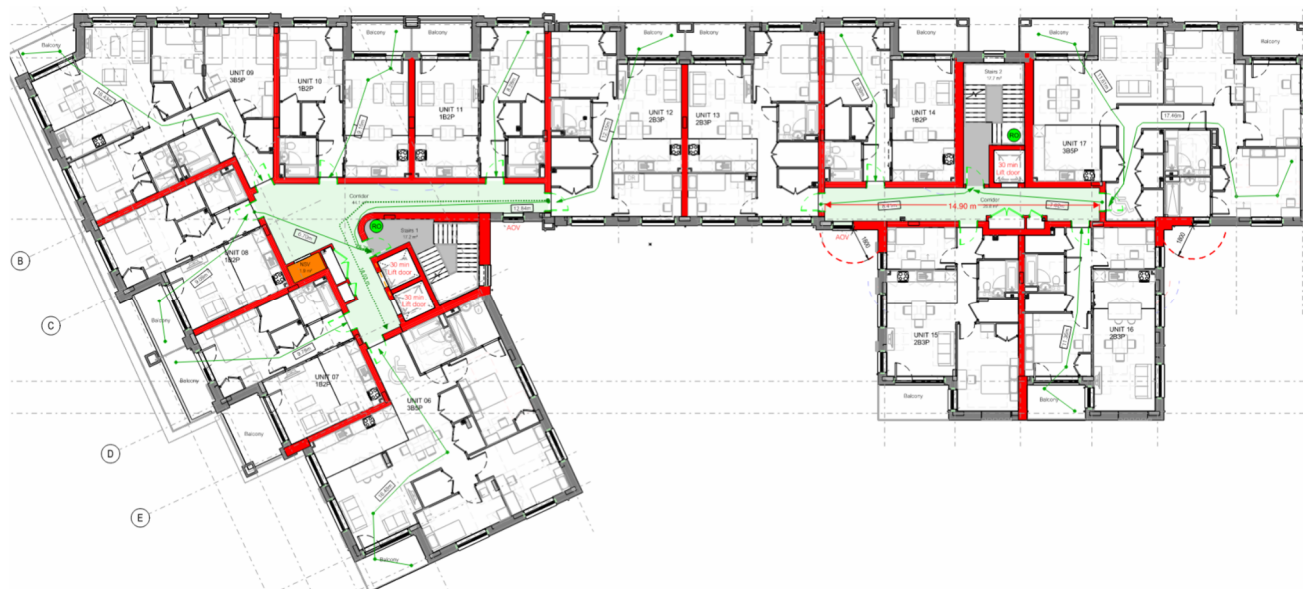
First floor layout (Dwg No: M9534-HUN-02-01-DR-A-05-4001).
